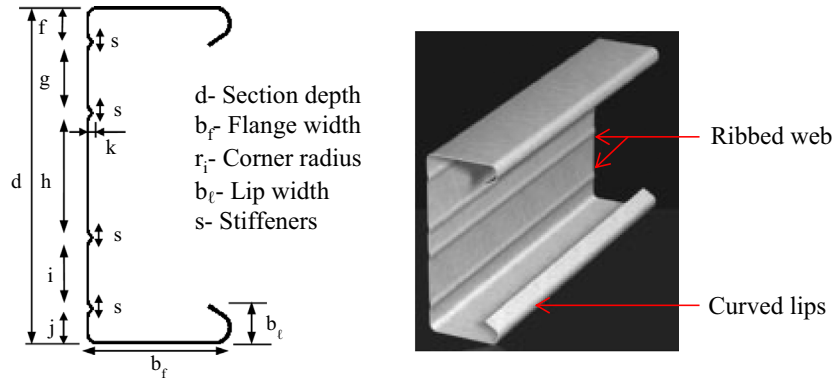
Web Stiffened Channel Section (SupaCee Section).
